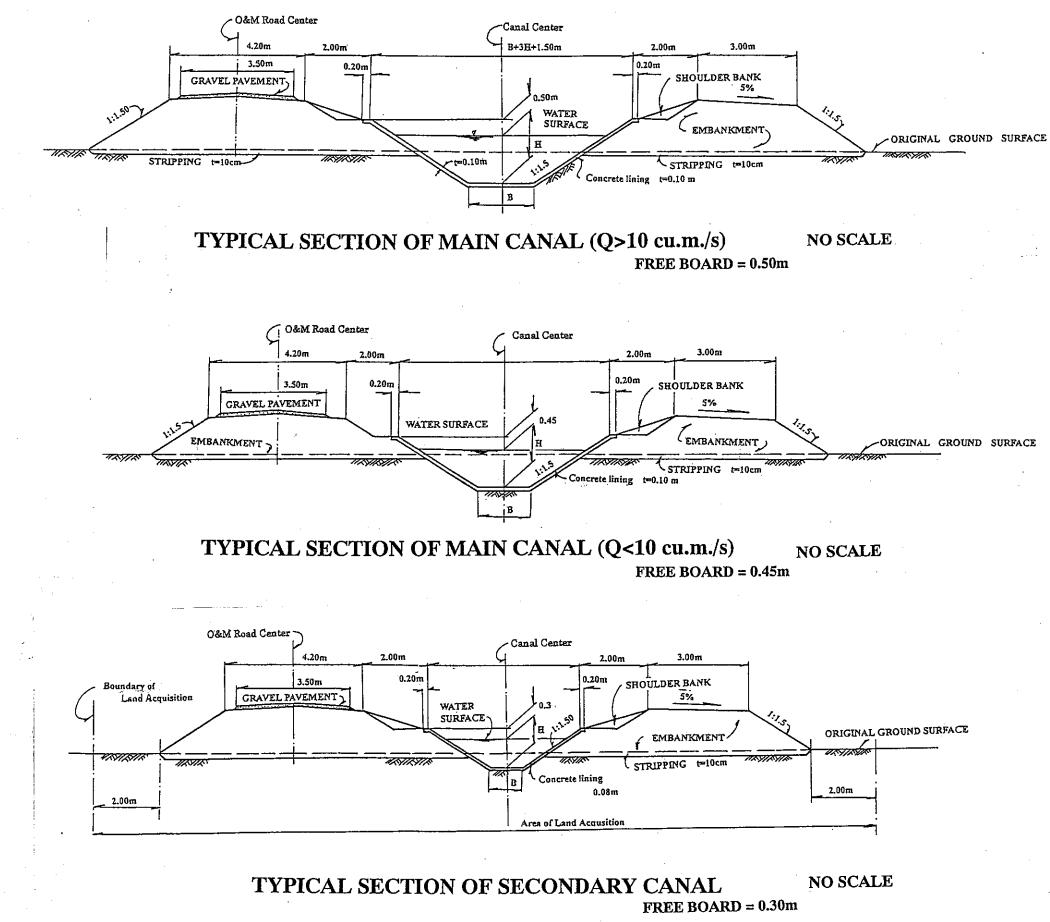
Typical Section of Qazvin Central Canal
